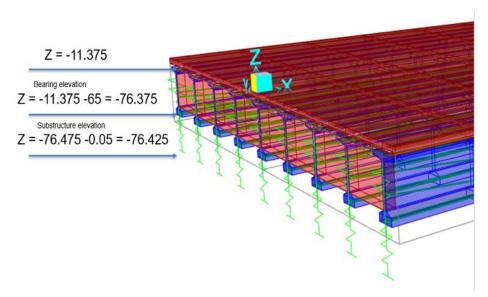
Model. Bearing and substructure elevation in CSIBridge
